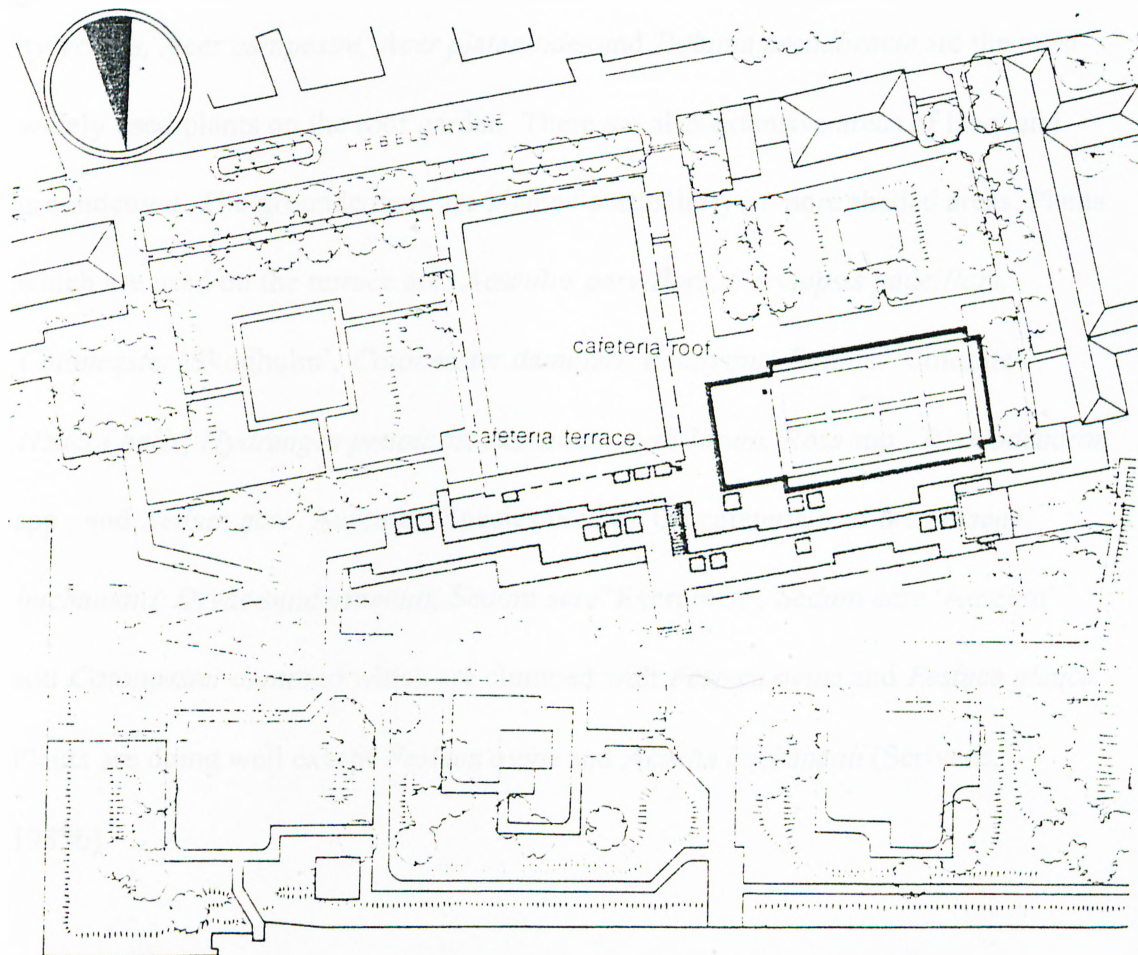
Plan showing the three roof gardens at Kantonsspital, Basle (Scrivens, 1982b, p. 65).
